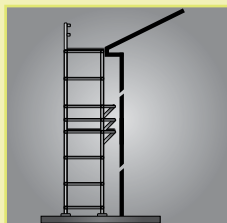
(a) Scaffold platform at edge of roof with hop-up bracket for other trades
